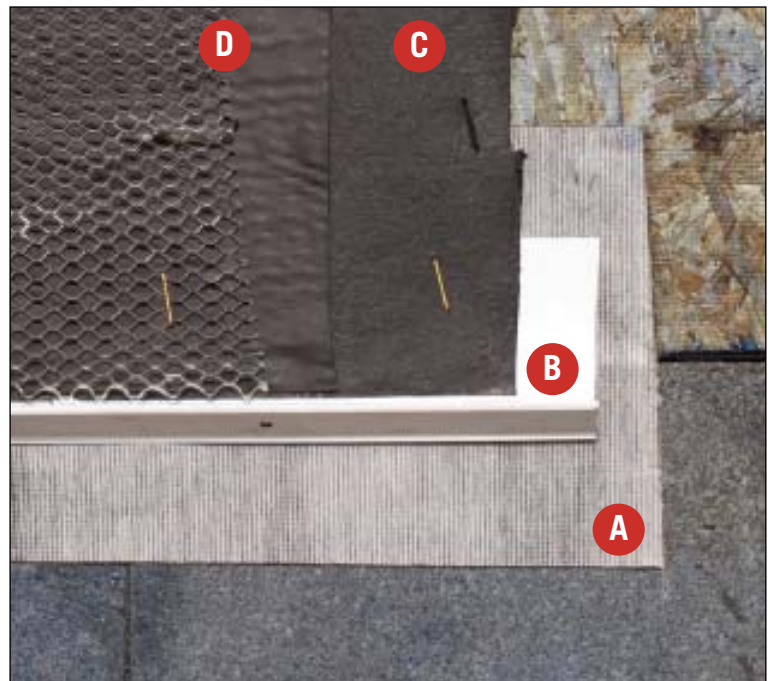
CONTROL JOINT. Where wood-framed upper walls meet masonry basewalls, code allows a metal expansion joint applied on top of the weather barrier — a detail that allows water that gets past stucco to drain into the basewall. To create a true drainable assembly, flash the joint with a peel-and-stick membrane (A), then apply a weep screed (B). Bring the upper-story weather barrier (C) over the top leg of the weep screed, then apply paper-backed lath, (D) which provides both a bond breaker and reinforcement for the scratch coat.
